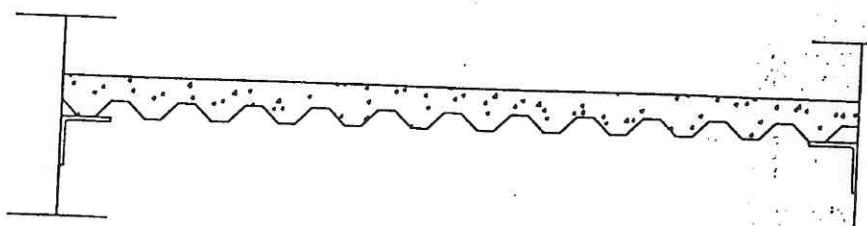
Crossover cross-section. Note: transverse members allow the deck to run parallel to the girders as shown.
